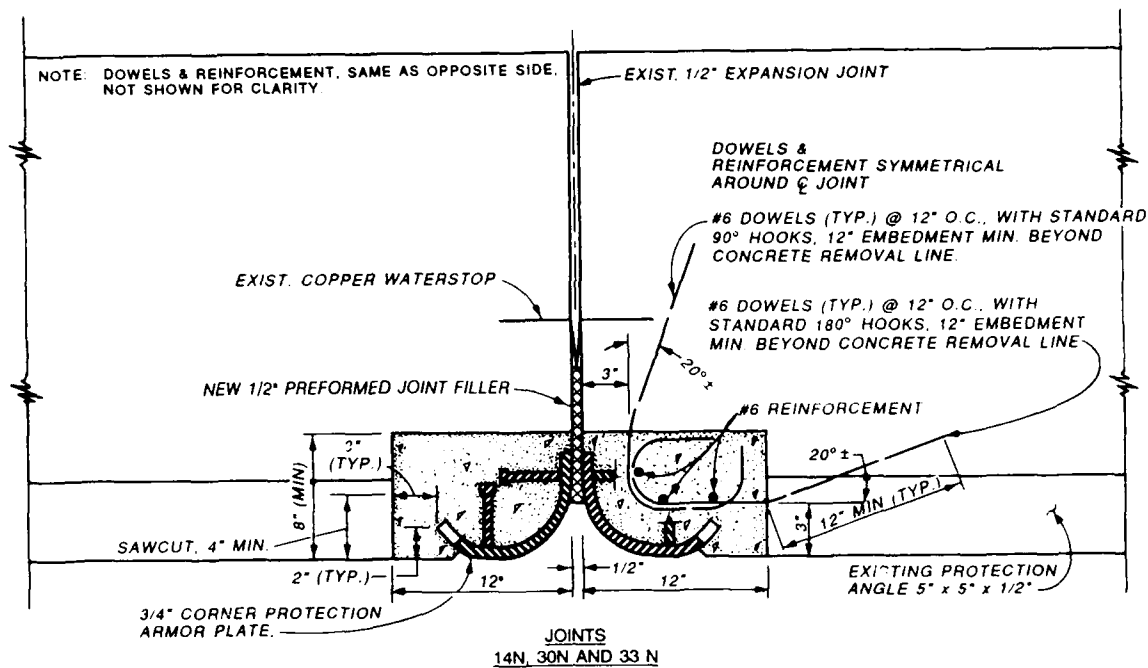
Monolith joint repair details for joints 14N, 30N, 33N, Algiers Lock
